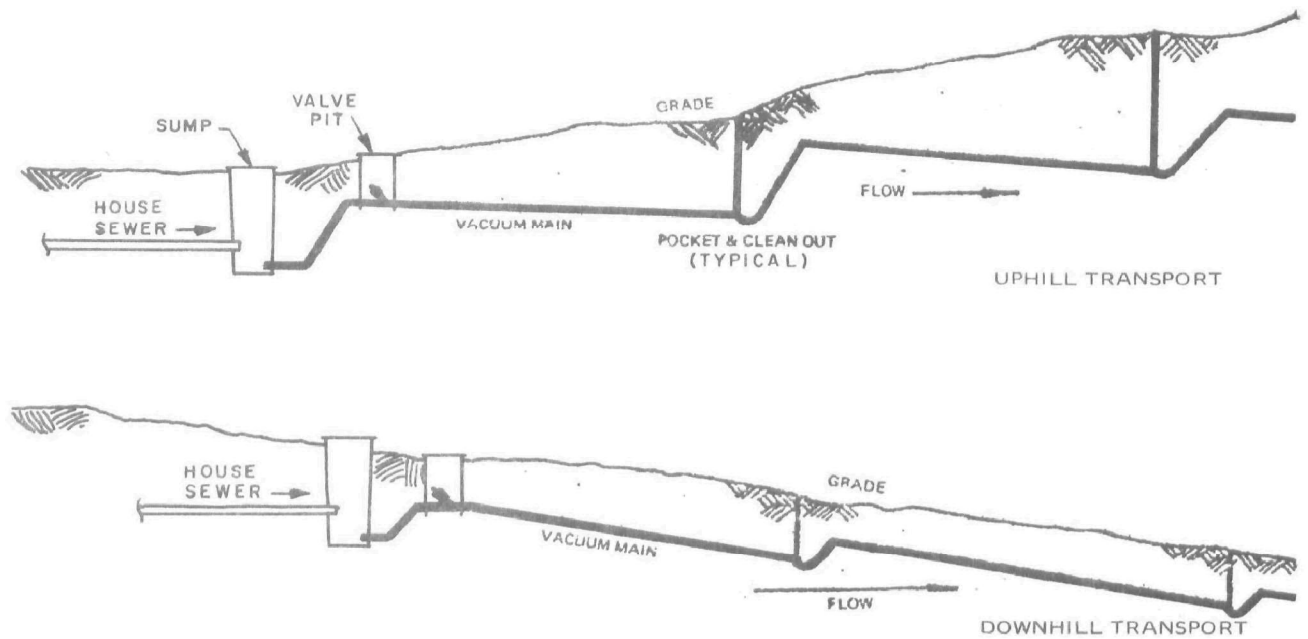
Typical vacuum pipe configuration details for uphill and downhill wastewater transport.
